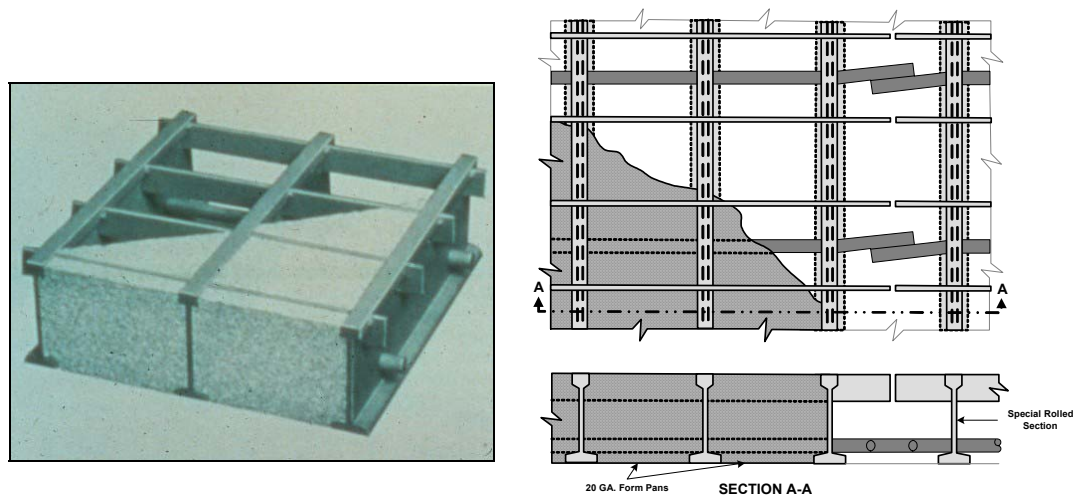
Schematic of Concrete Filled Grid Deck
